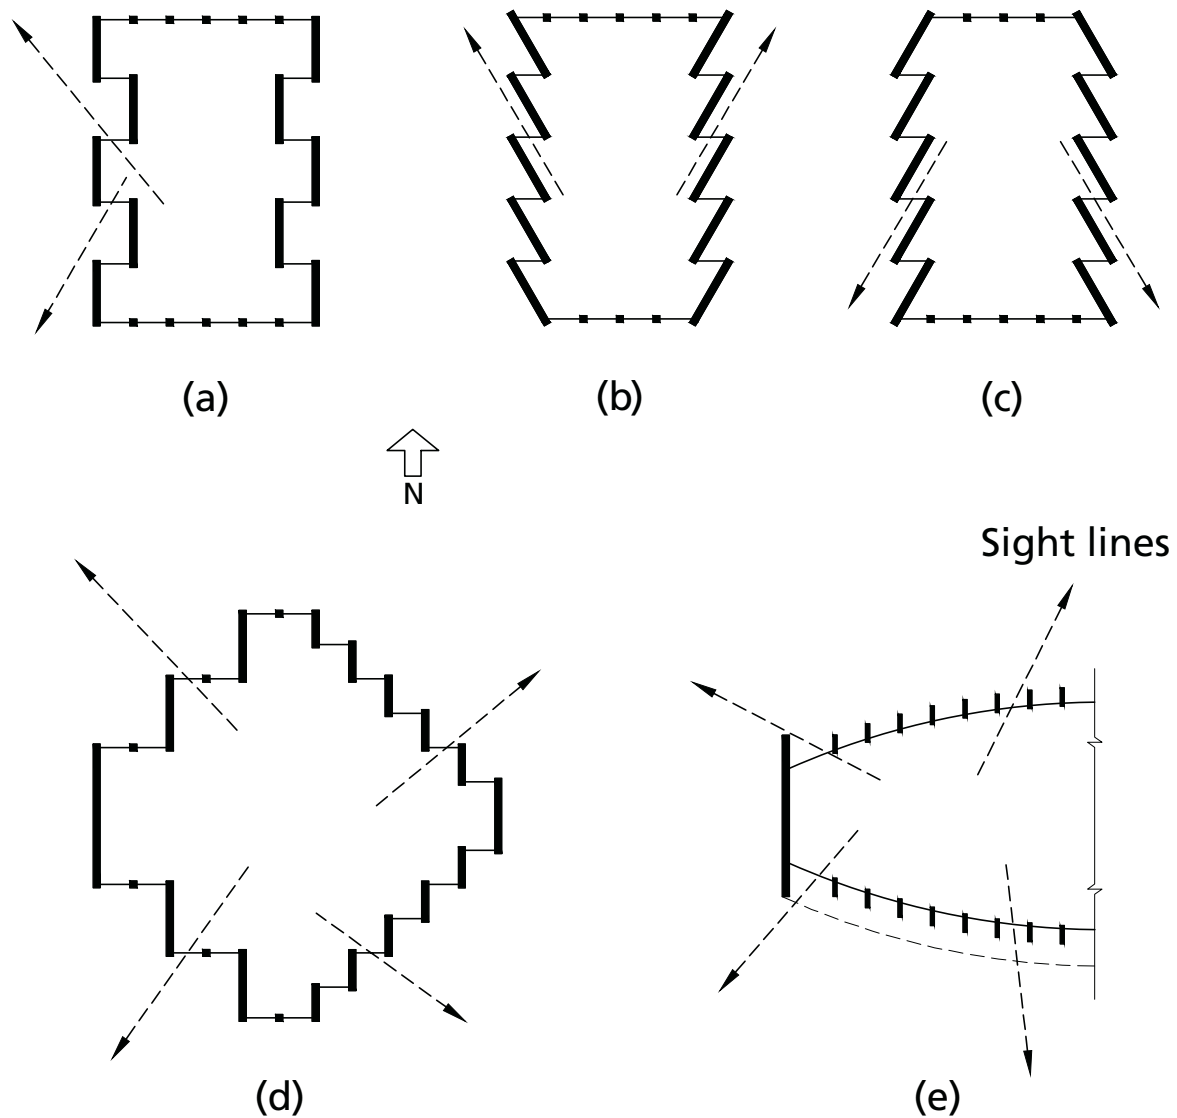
These plans illustrate how windows on east and west facades can face either north or south.
